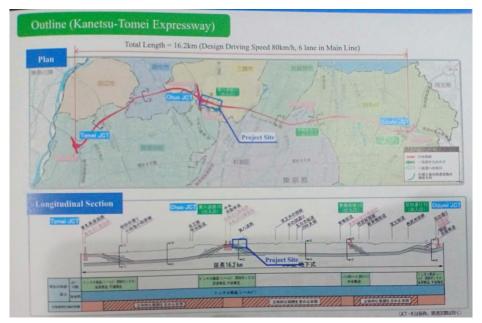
The Plan and Longitudinal Section of the Tokyo Outer Ring Road JCT North Ramp Project
